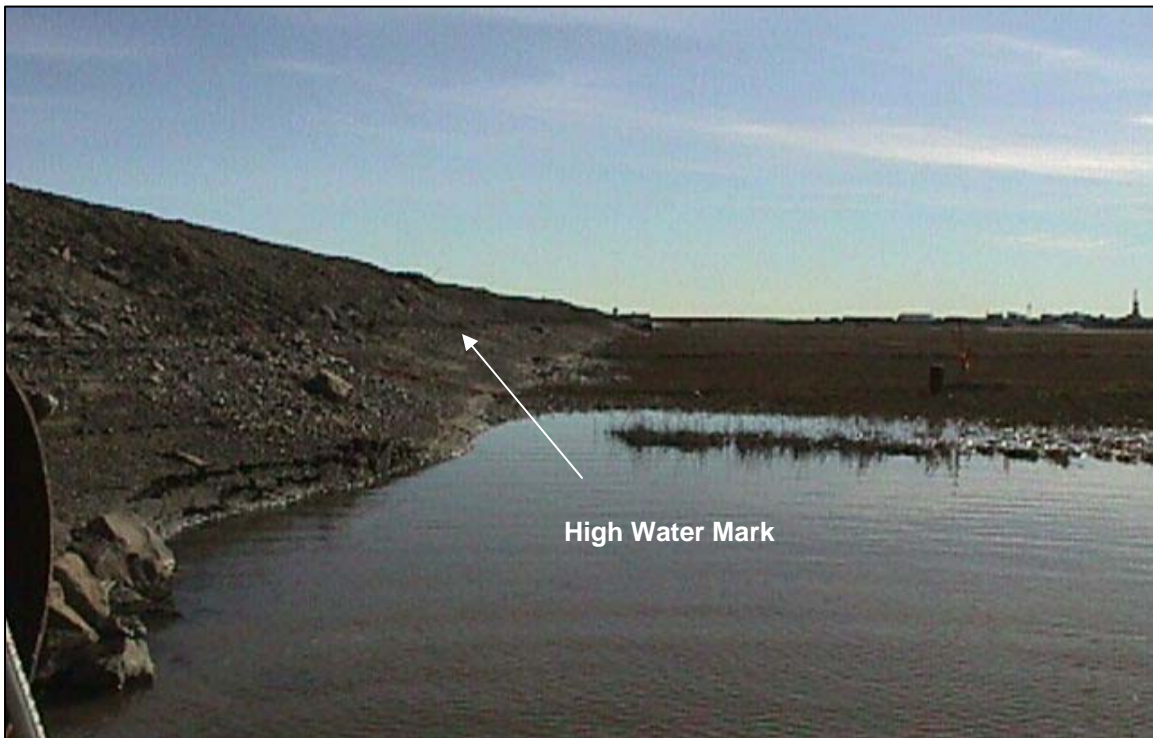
Looking east along the north side of the embankment on the road to CD-2 near culvert #24. (6/15/00)
